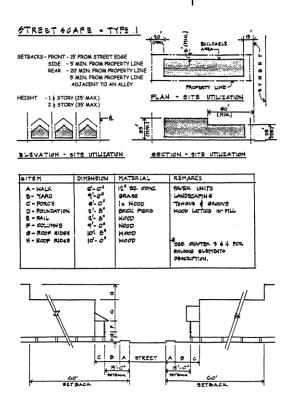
WOOD COTTAGES DISTRICT-STREETSCAPE, TYPE 1
